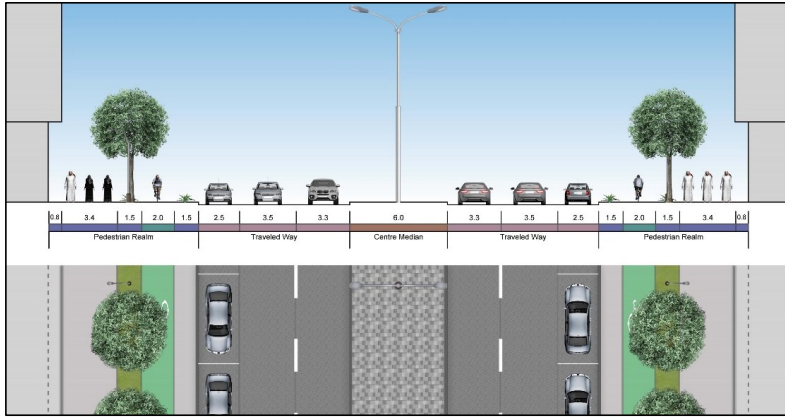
Cross section of Typical city Avenue at Abu Dhabi
